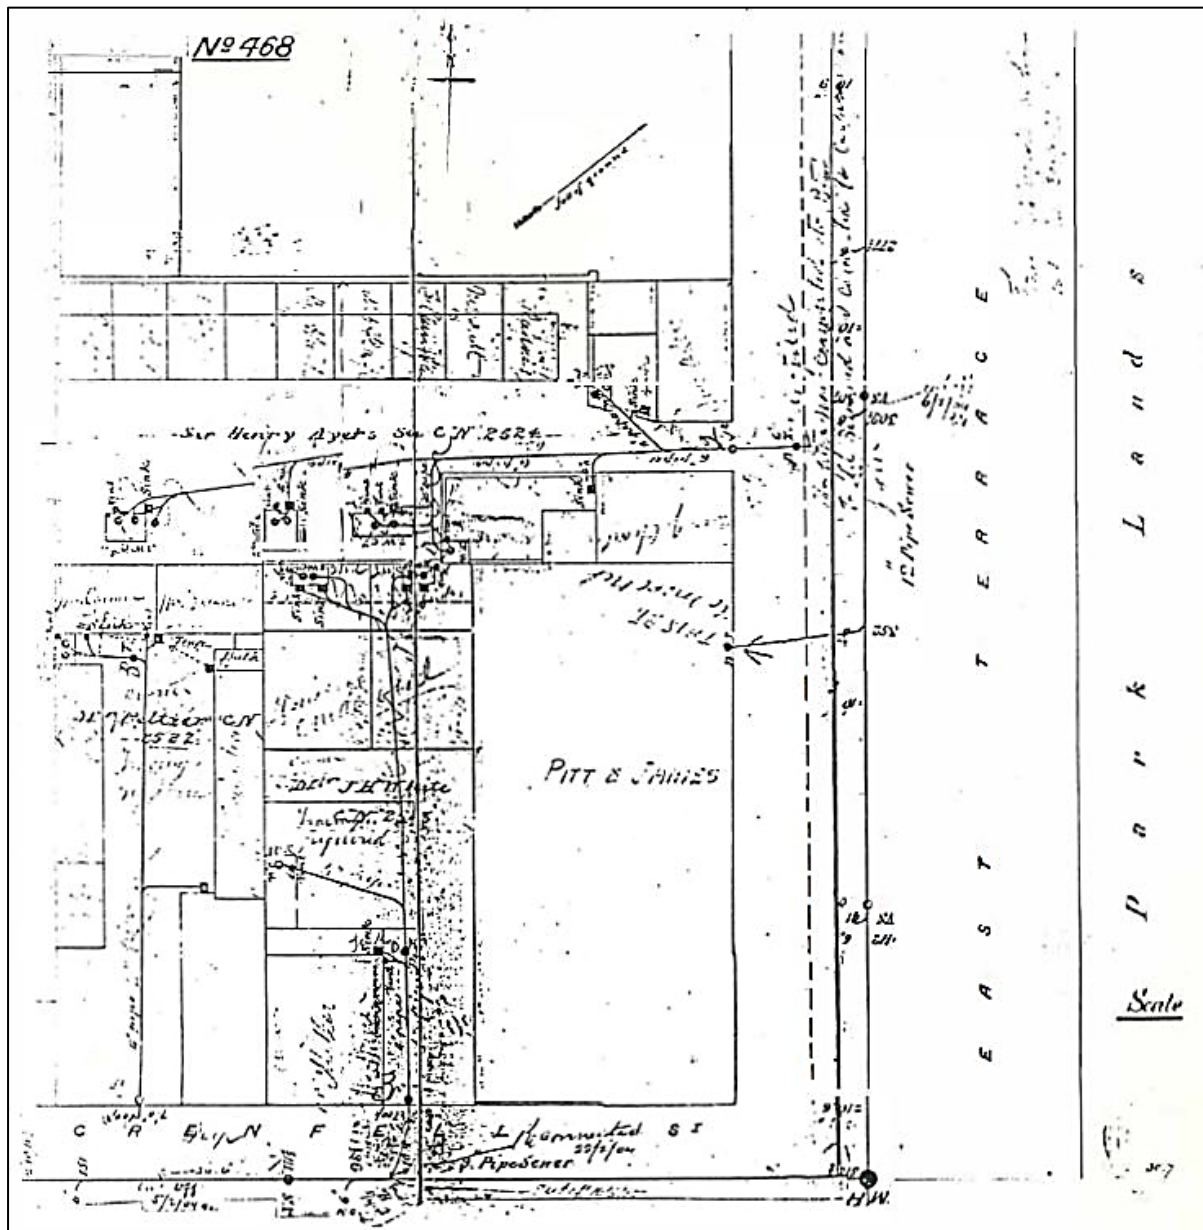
Town Acre 94, Engineering and Water Supply plan of sewerage and drainage, 1883 (Austral Archaeology 1992a:9).
